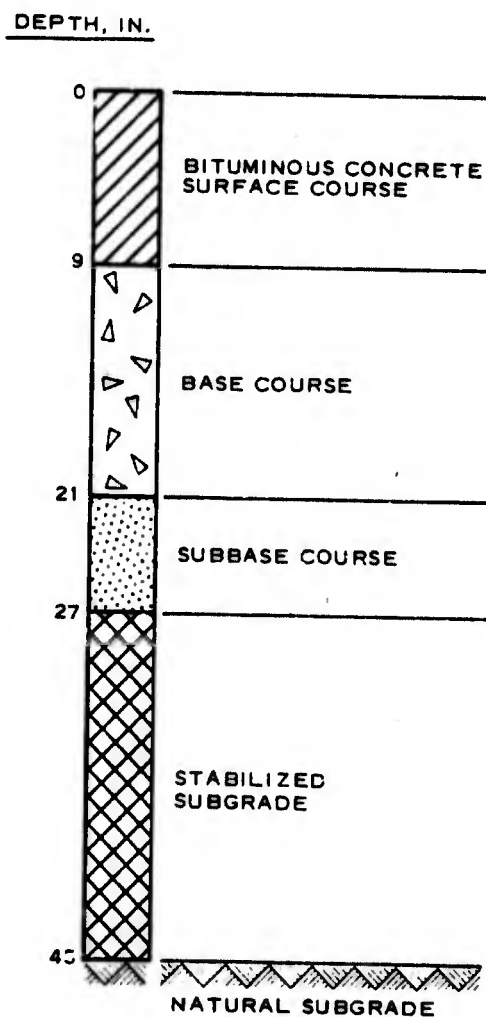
Design section for conventional flexible pavement with stabilized subgrade
